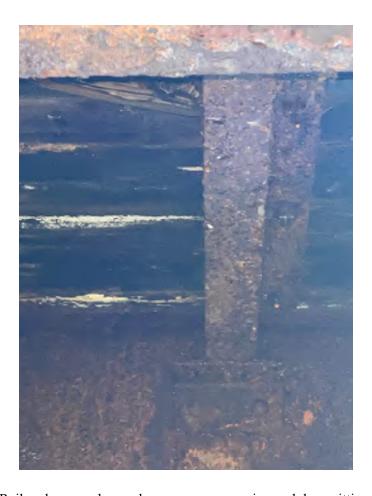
Gordy Jolma No 9 Railcar beam and cross beam severe corrosion and deep pitting
